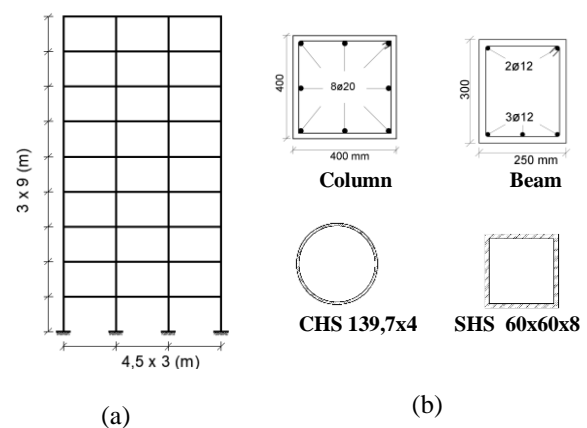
Reinforced concrete frame (a) numerical model (b) column, beam and braces cross-section details
